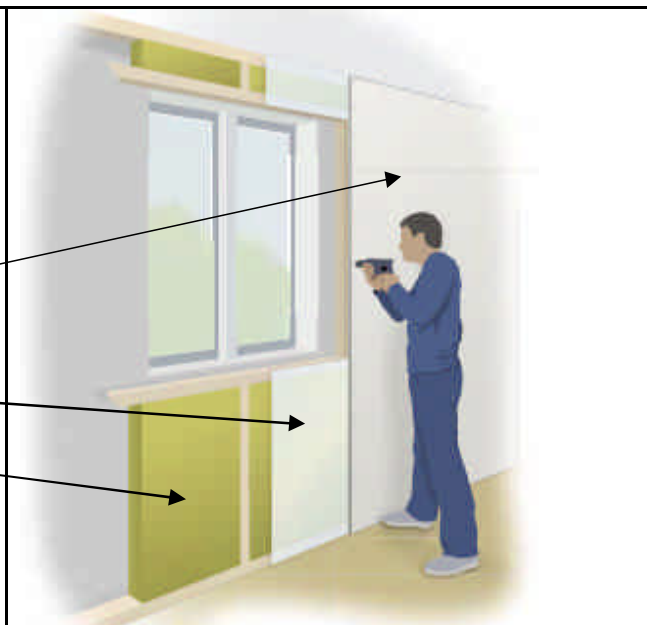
Air tight layer at external wall for building renovation from inside.
